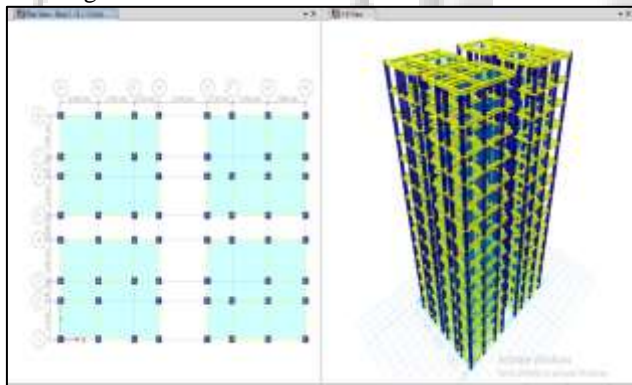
Model showing plan 3d view of high rise building without bracings in linear analysis
